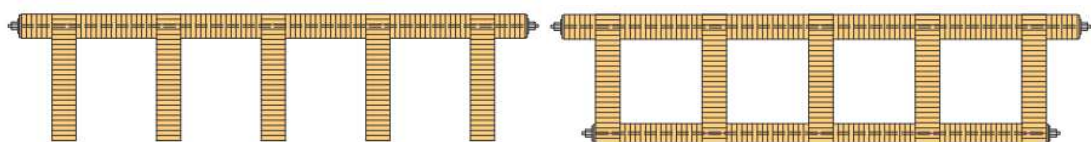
Stress laminated T-beam and box-beam bridge. (10)
